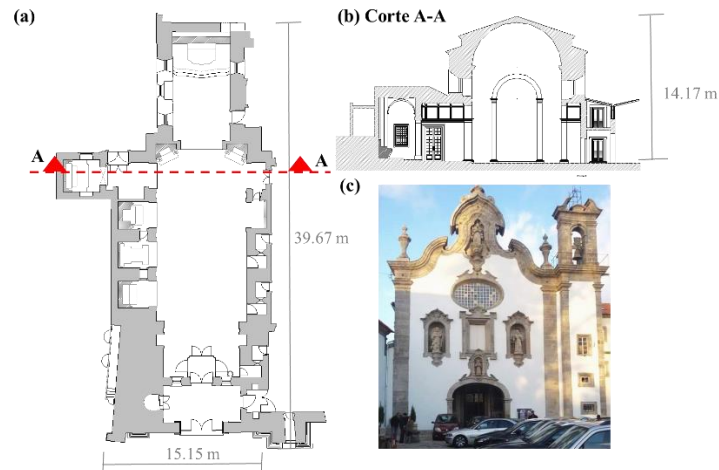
Santo António Church: (a) view in plant, (b) section AA and (c) main façade.
